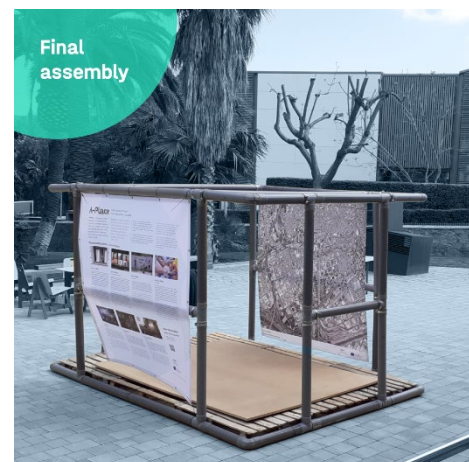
Built prototype with PVC ducts installed in La Salle campus
